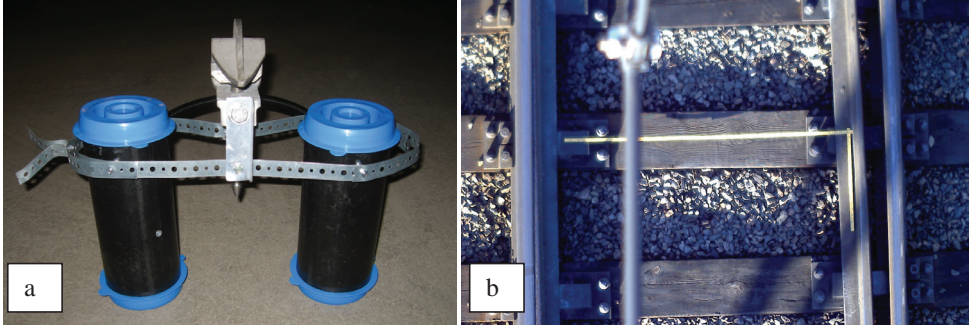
a) Camera kit for the tests. b) Picture of a test installation taken with the camera. (Damill AB)
